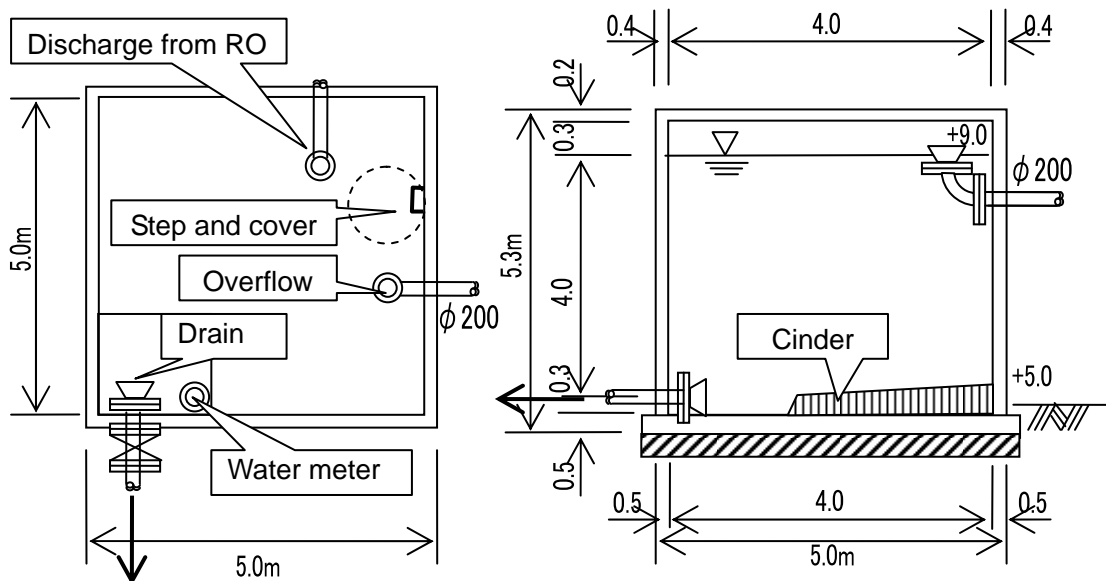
Structural Drawing of Wastewater Storage Tank
